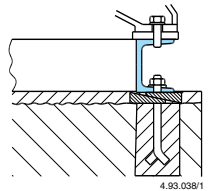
Foundation for unit mounted on welded, steel-section baseplate.
